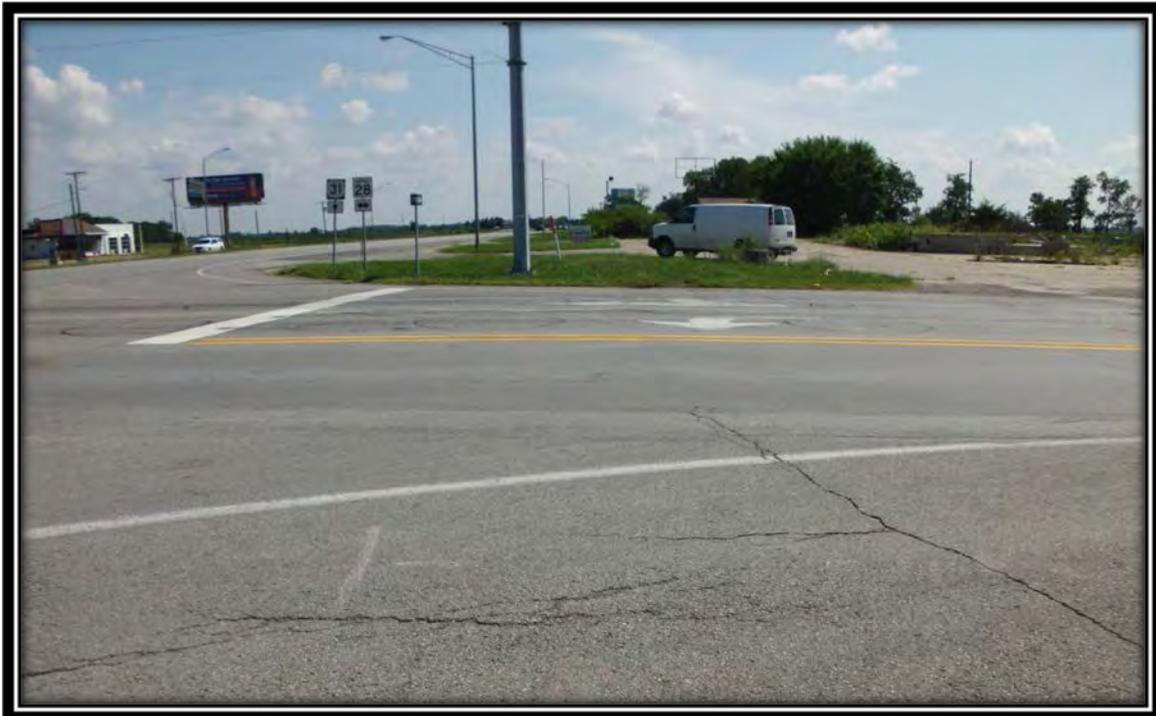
Looking south from the US 31 & SR 28 intersection along the west side of US 31. Note house at the southwest corner of the intersection has been demolished and only some foundations remain.
